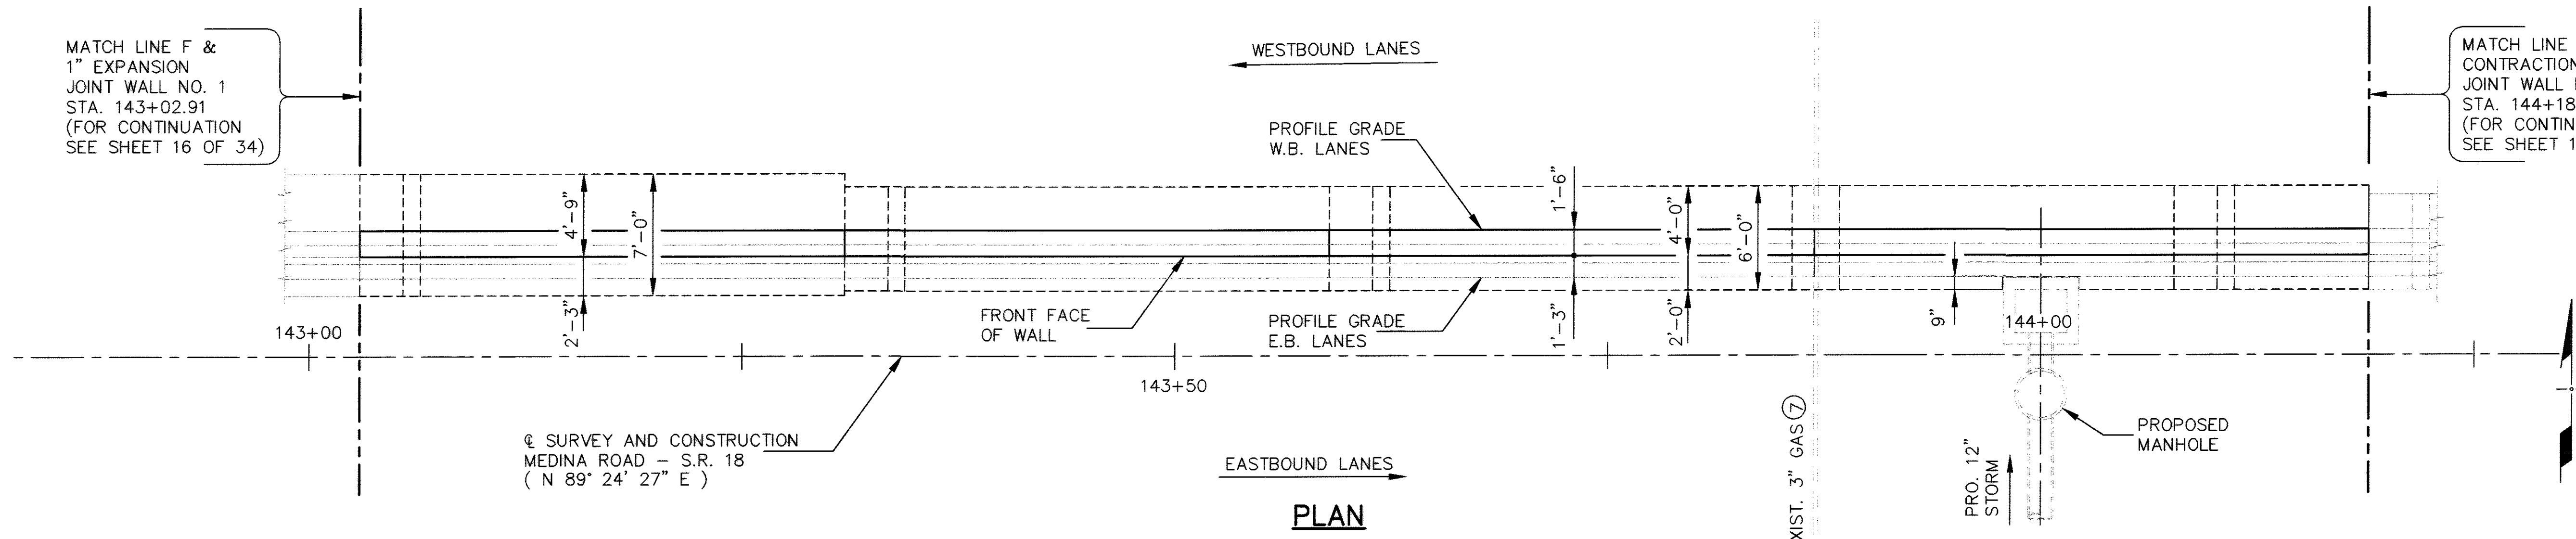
(PANELS W1-21 THRU W1-24)
